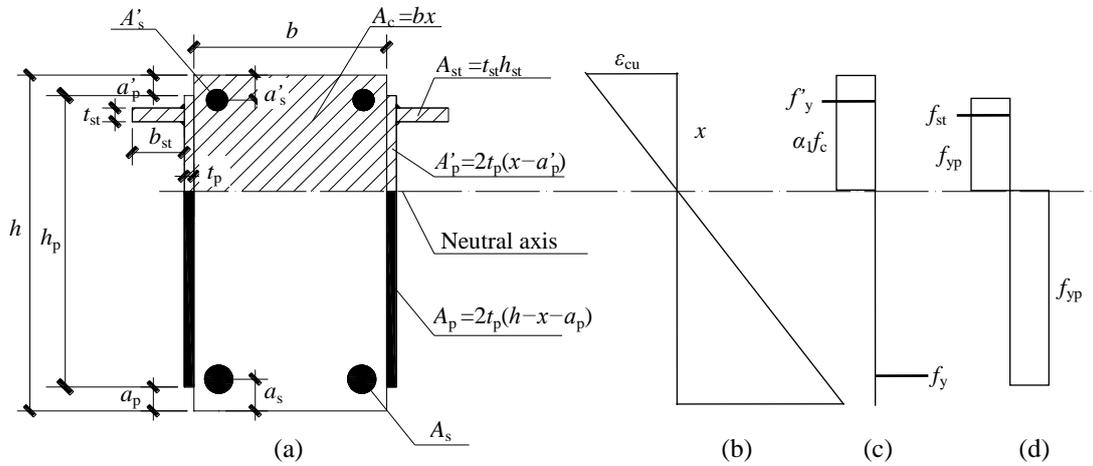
Stress and strain profile of a BSP beam section: (a) cross section, (b) strain profile, stress profile of (c) the RC beam and (d) the bolted steel plates and the buckling restraining stiffeners
